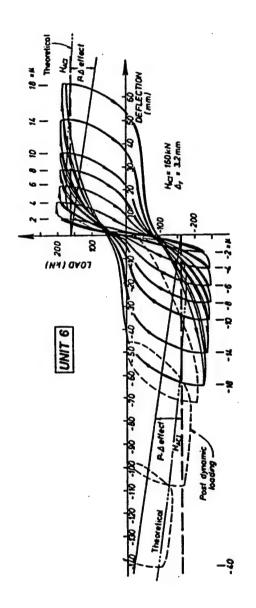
Force displacement response of concrete-filled steel shell pile connected to deck by dowels.
